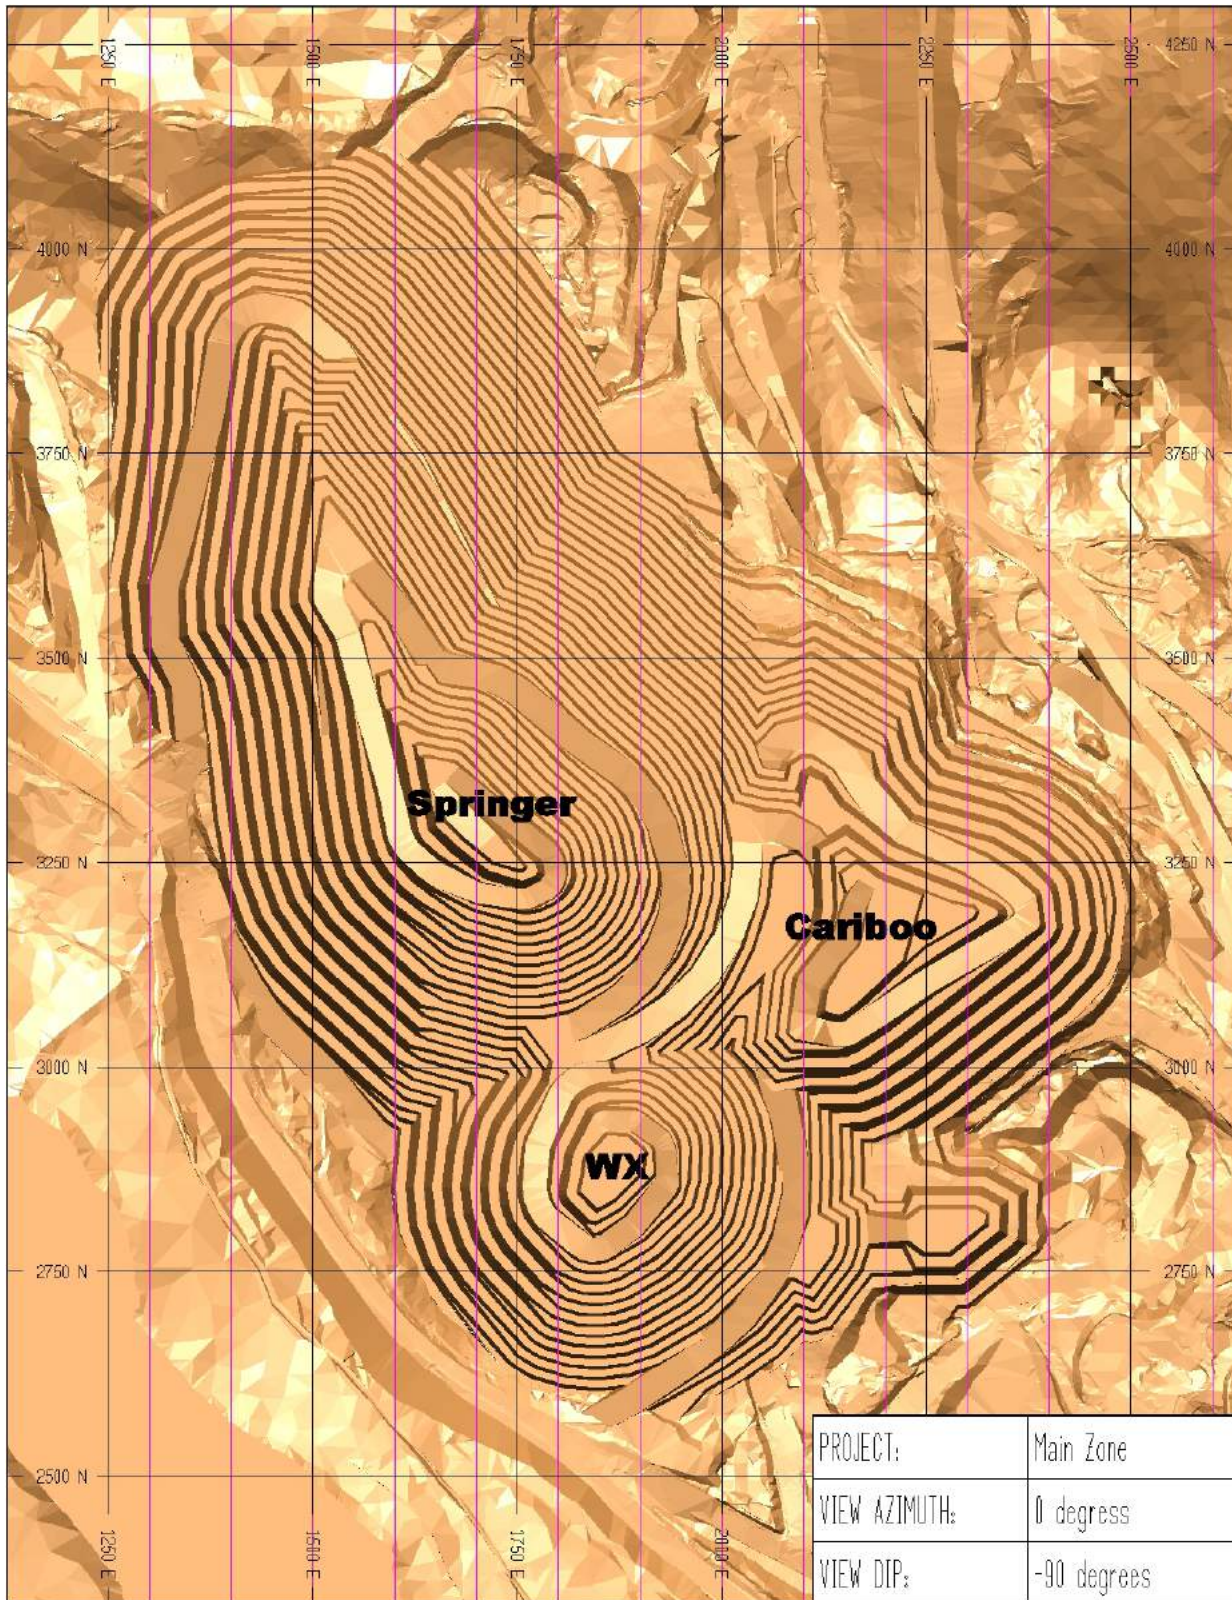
Plan View of January 1, 2016 topographic surface in the Main Zone
